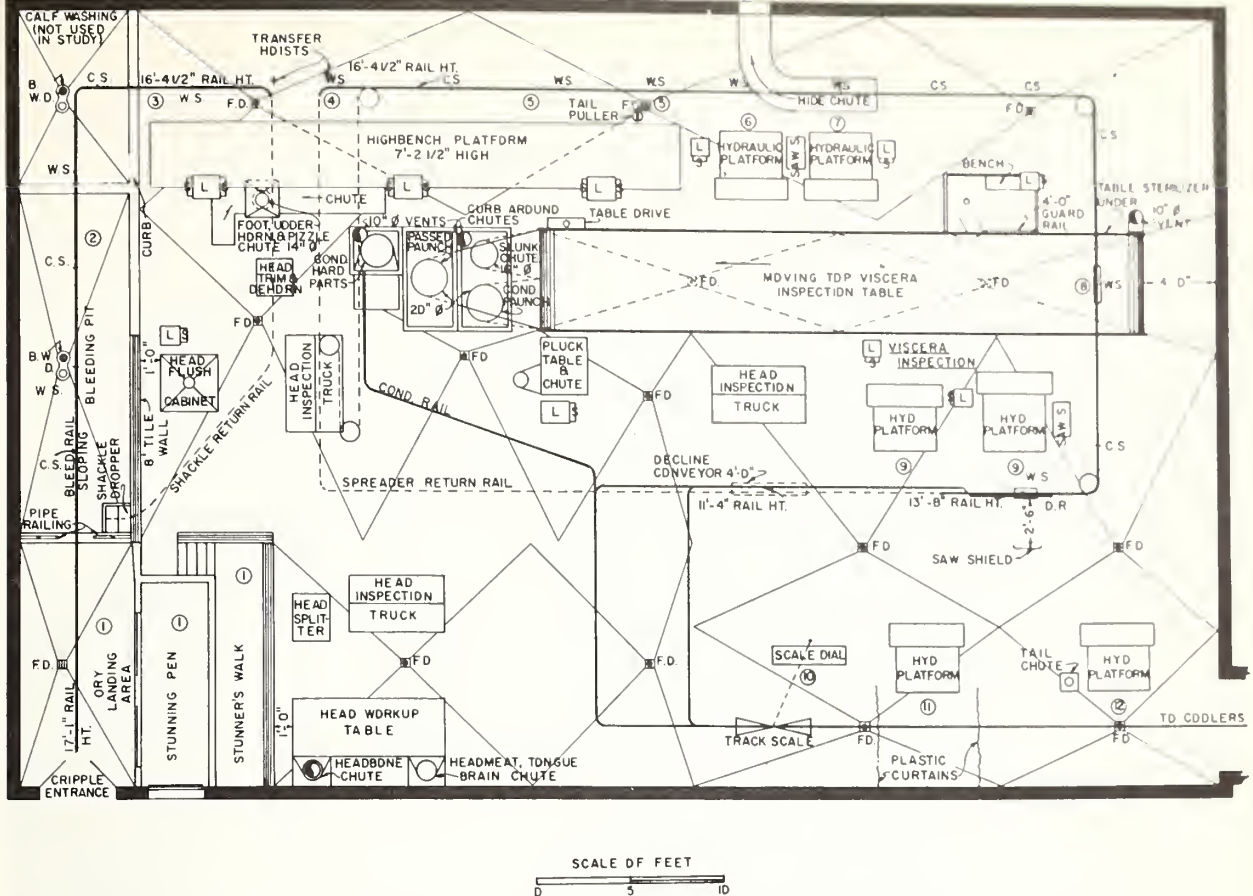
Suggested layout of a powered on-the-rail killing-floor system designed to slaughter 24 cattle per hour.
